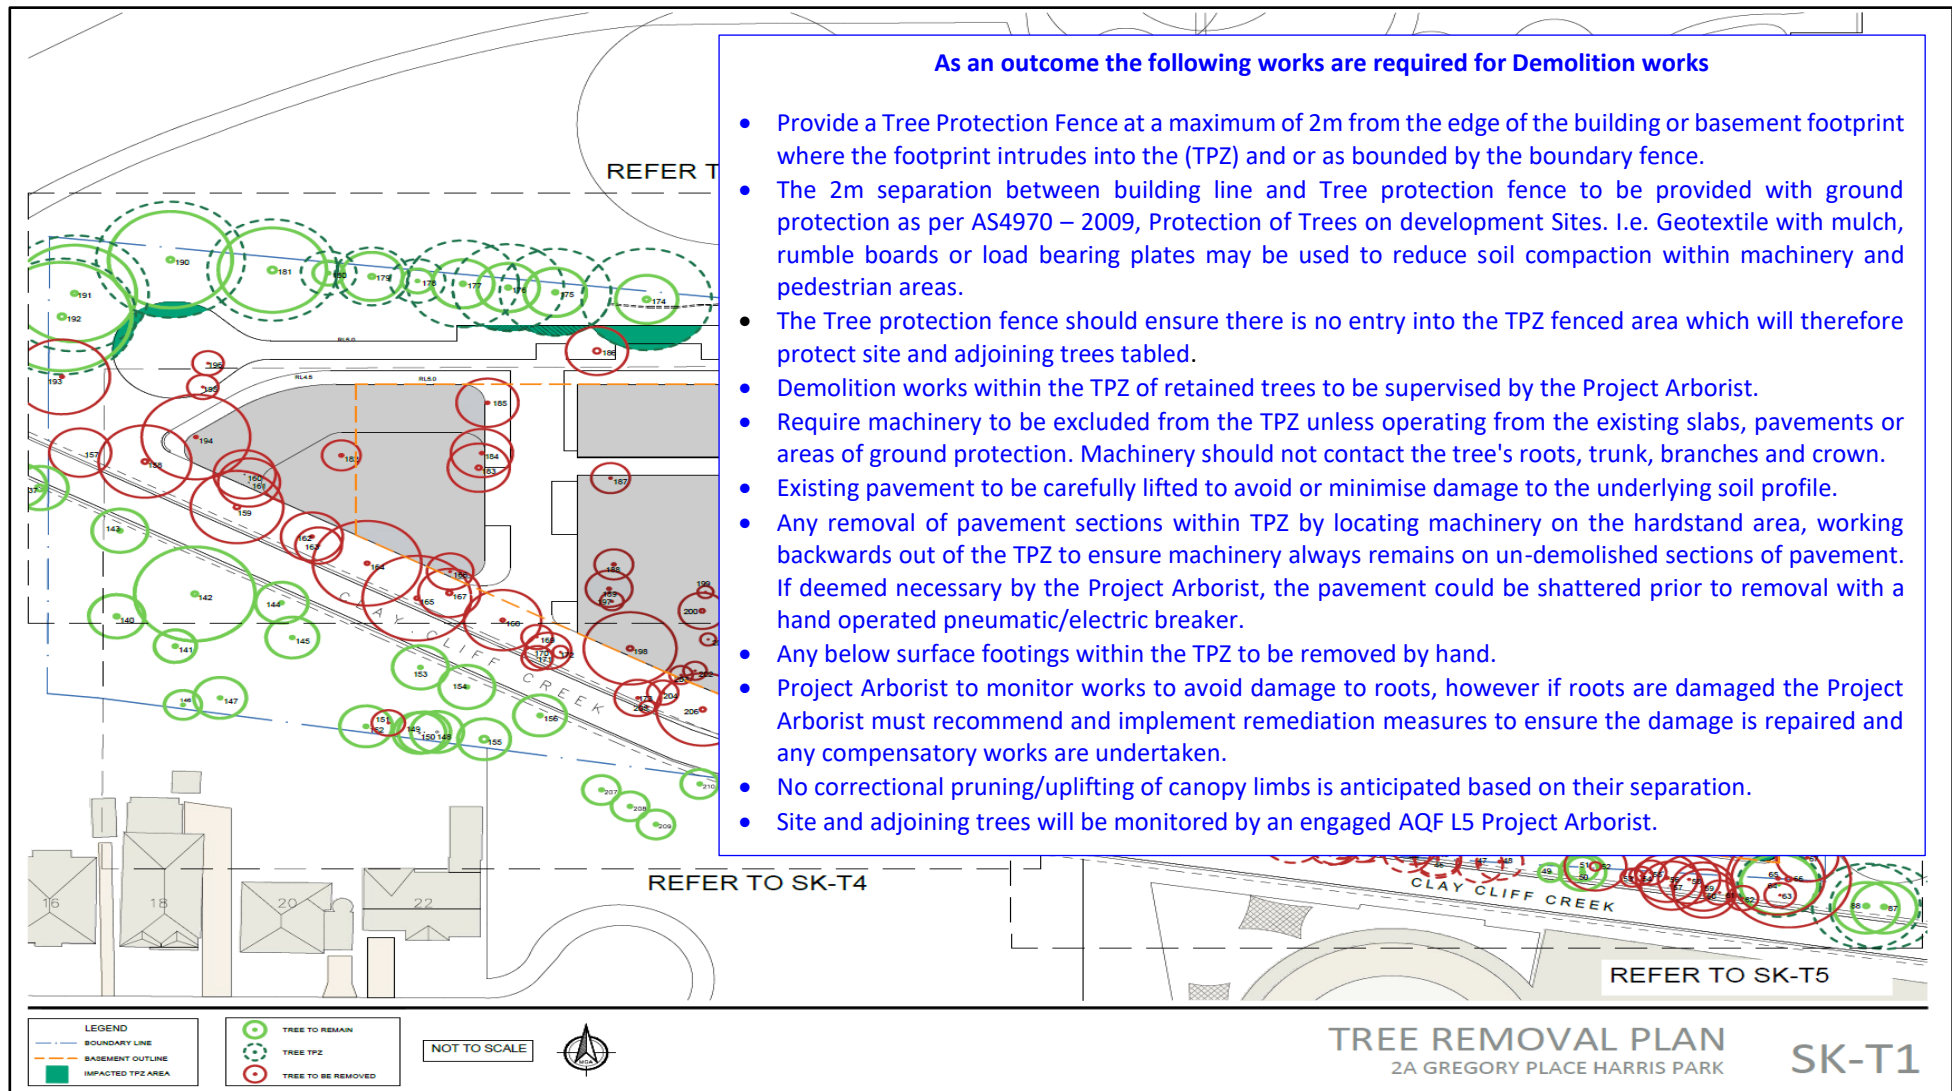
Shows site and adjoining tree protection measures regarding demolition works.
